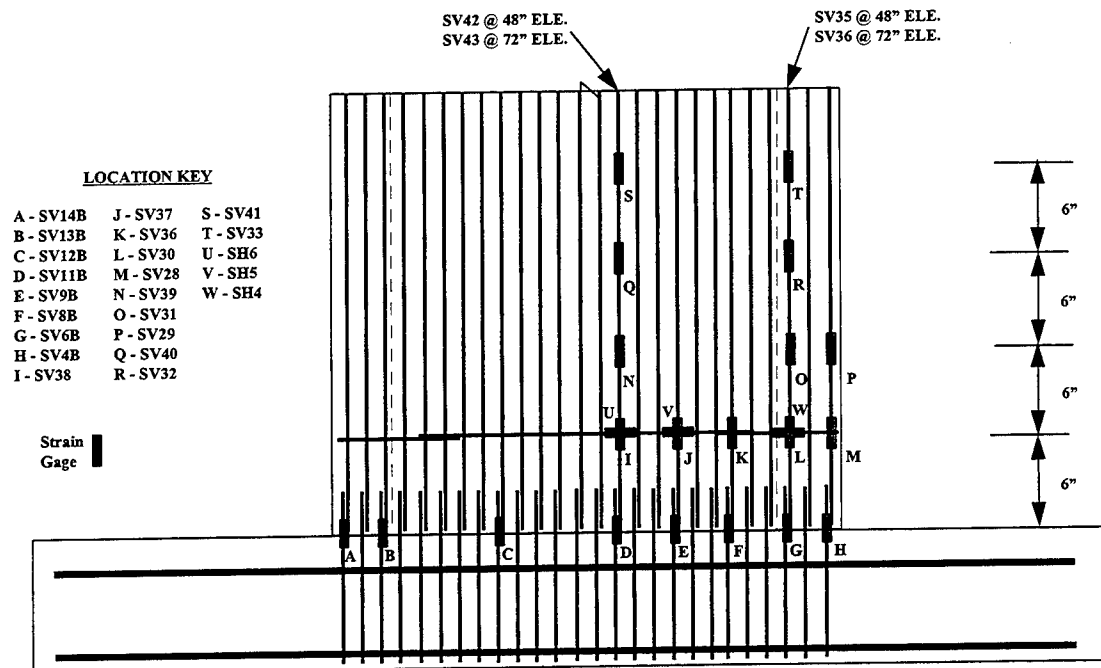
Location of strain gages mounted on exterior reinforcing layer, on east (tension) side of ITS-1 structure.
